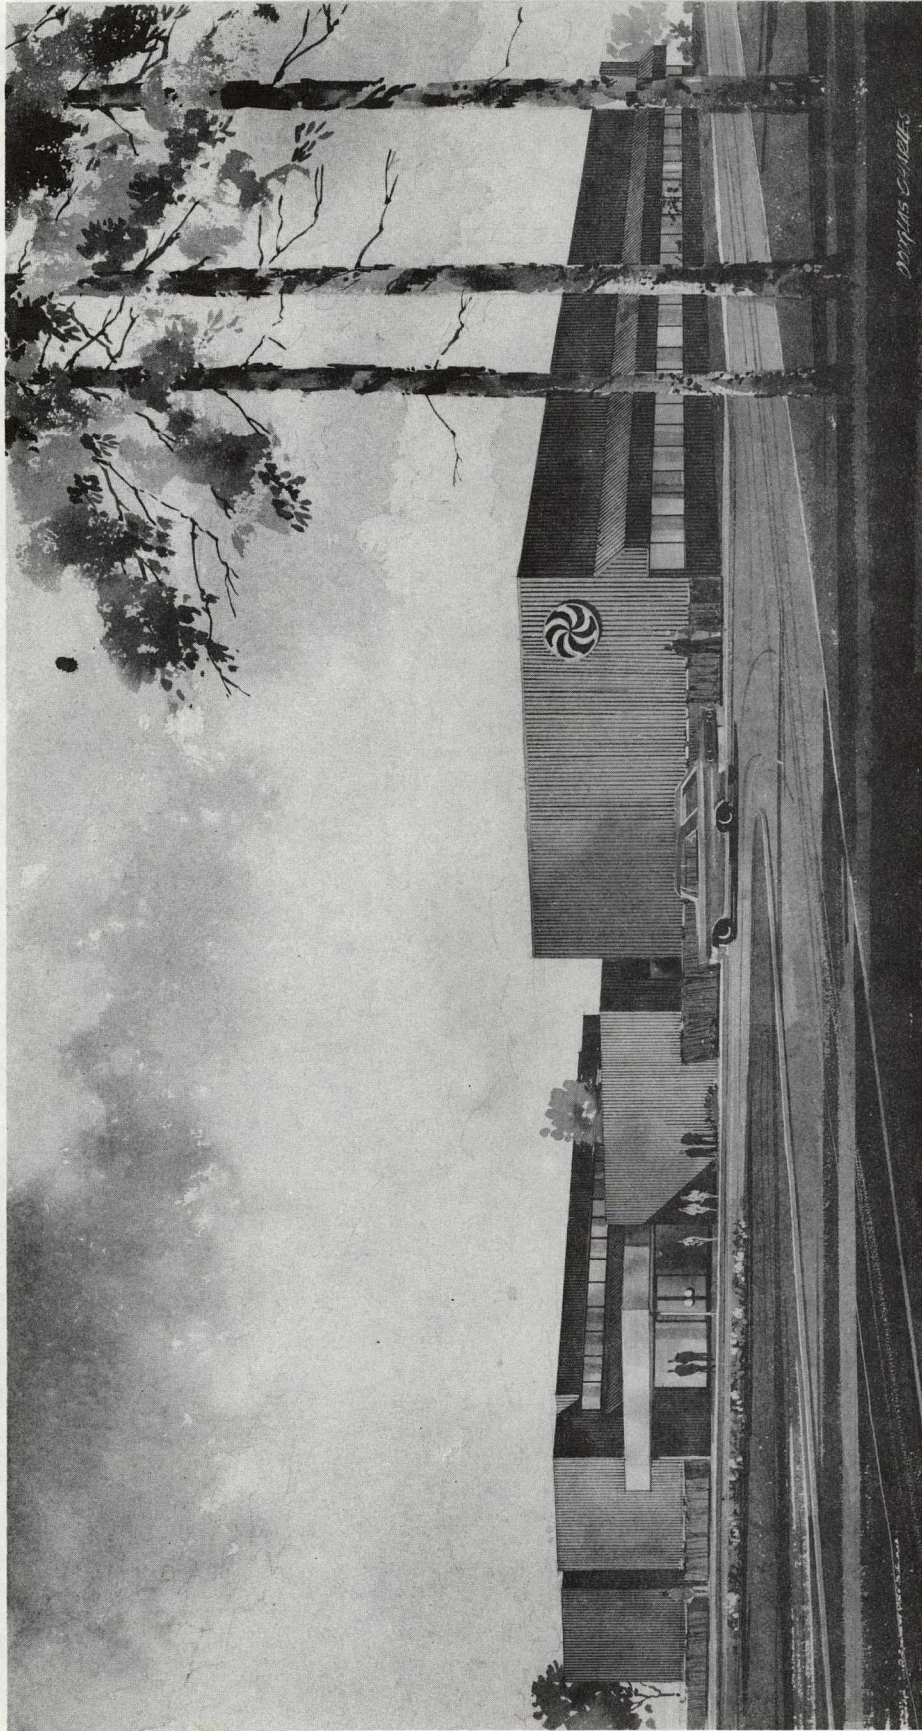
ARTIST'S IMPRESSION OF OFFICE, LABORATORY AND WORKSHOP BUILDING.
